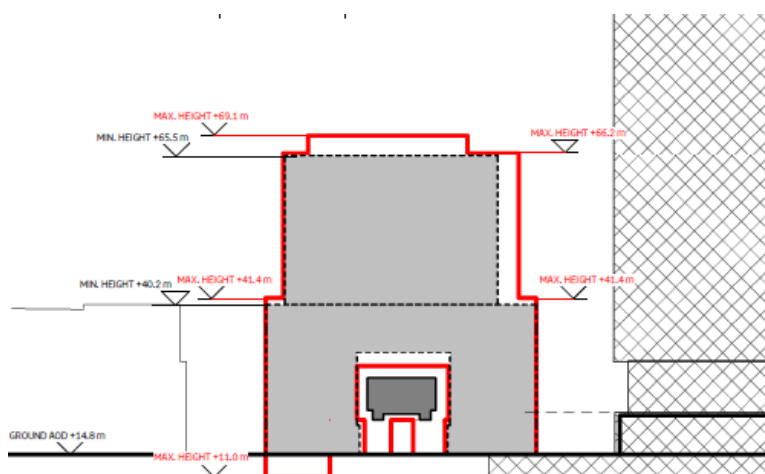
maximum (red line) and minimum (grey shaded) scale of Building 1
